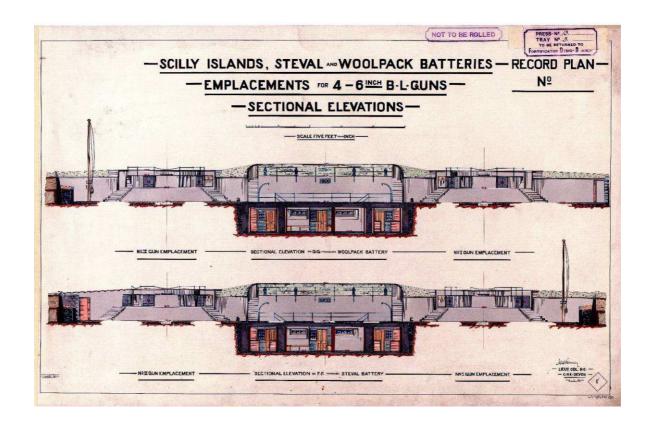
1901 Elevations of Steval and Woolpack Batteries (PRO)
